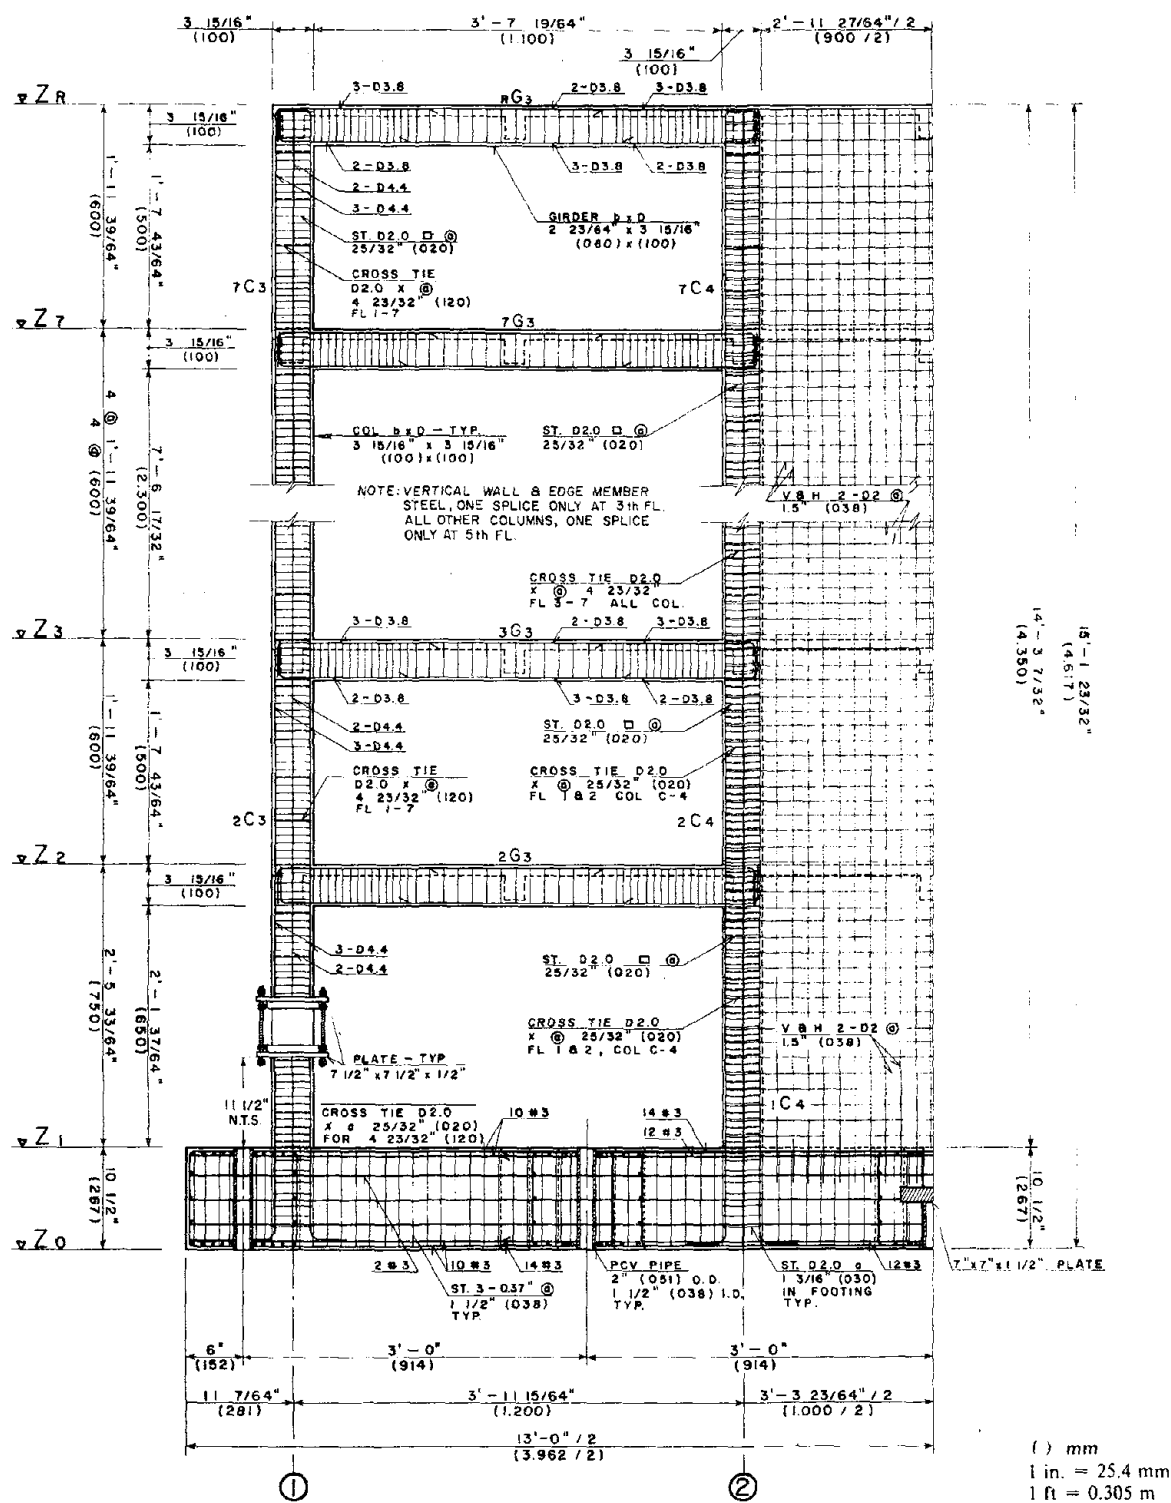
TYPICAL DETAILING OF THE INTERIOR WALL-FRAME OF THE 1/5-SCALE MODEL.
